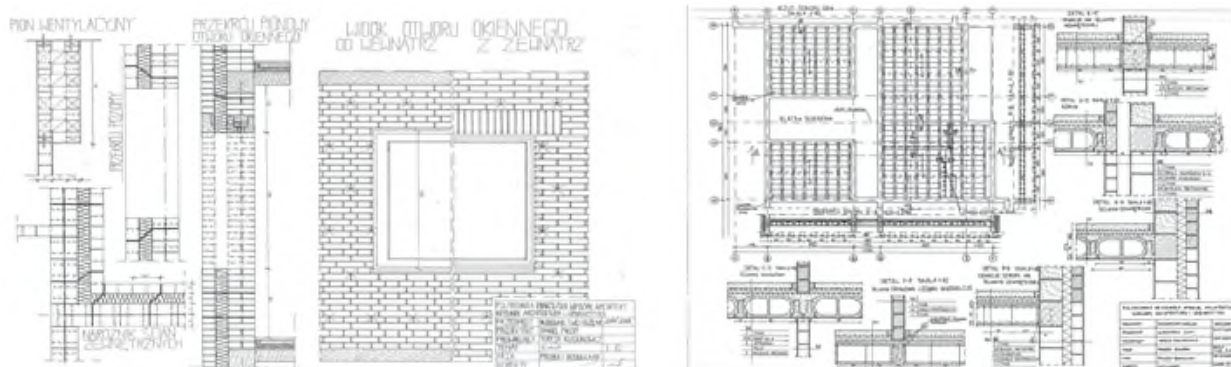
Example of a design project developed by students: a) preliminary design of a fragment of a multi-family residential building, student: K. Ożana; instructor: T. Kusonowicz; b) design of foundations and the underground part of the external wall of a multi-family residential building, student: A. Cichy, instructor: T. Kusonowicz.
